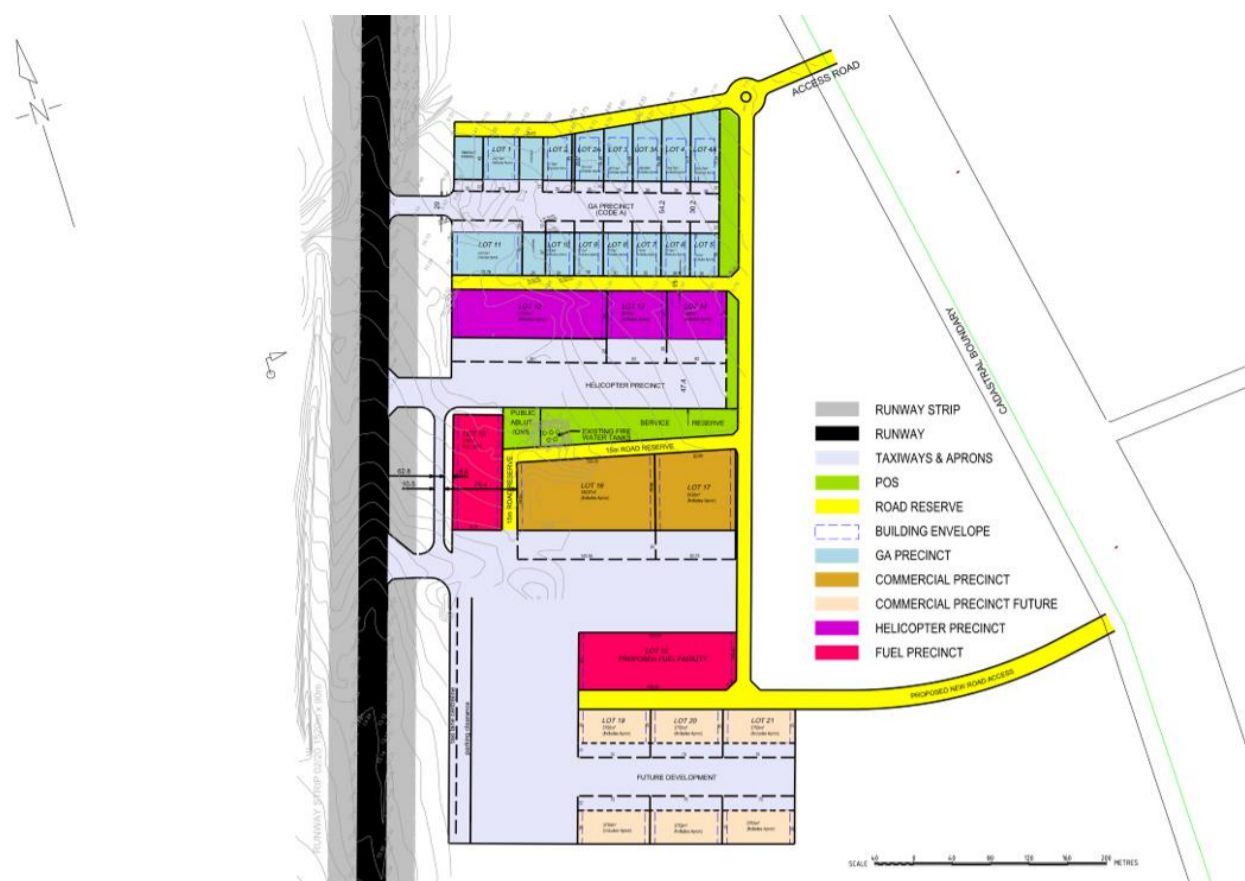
SU3 – Exmouth Aerodrome Locality Site Plan (Local Planning Scheme No. 4, p. 109)
